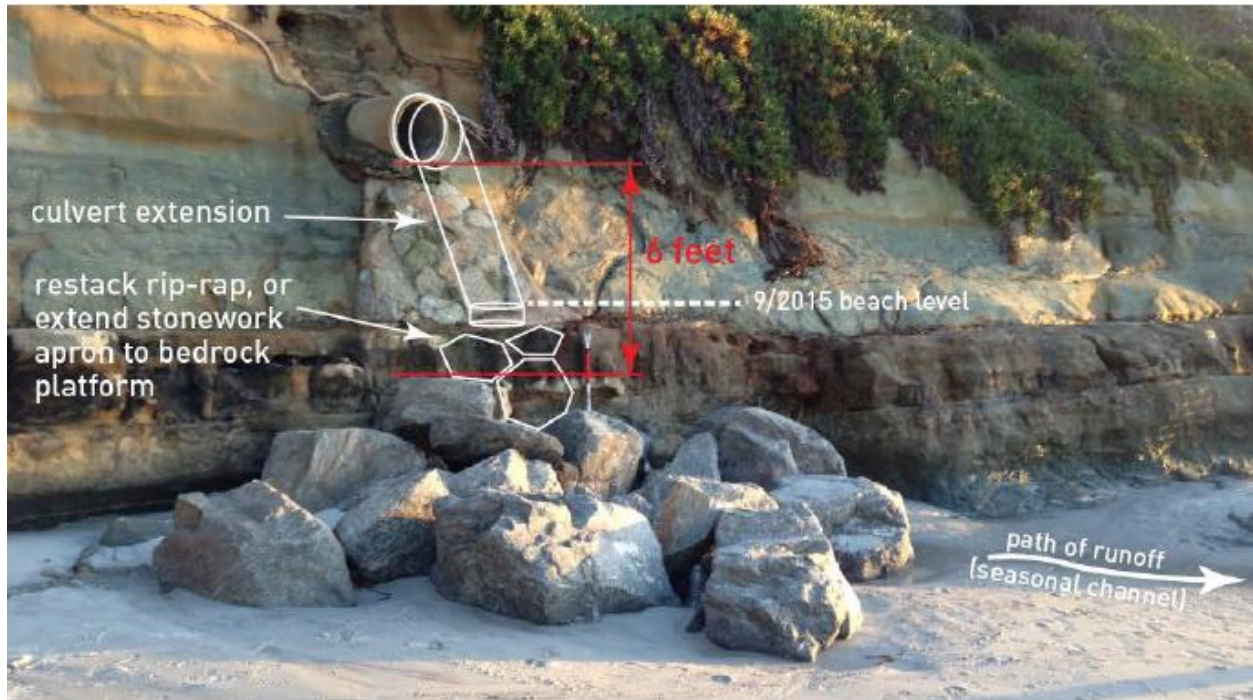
Storm Drain Outfall and Seawall S5 Northeast from Stairway ST4 on December 22, 2022
